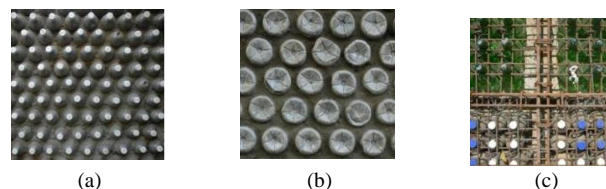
(a) Front elevation (b) Rear elevation (c) PET bottles as fillers in roofs
